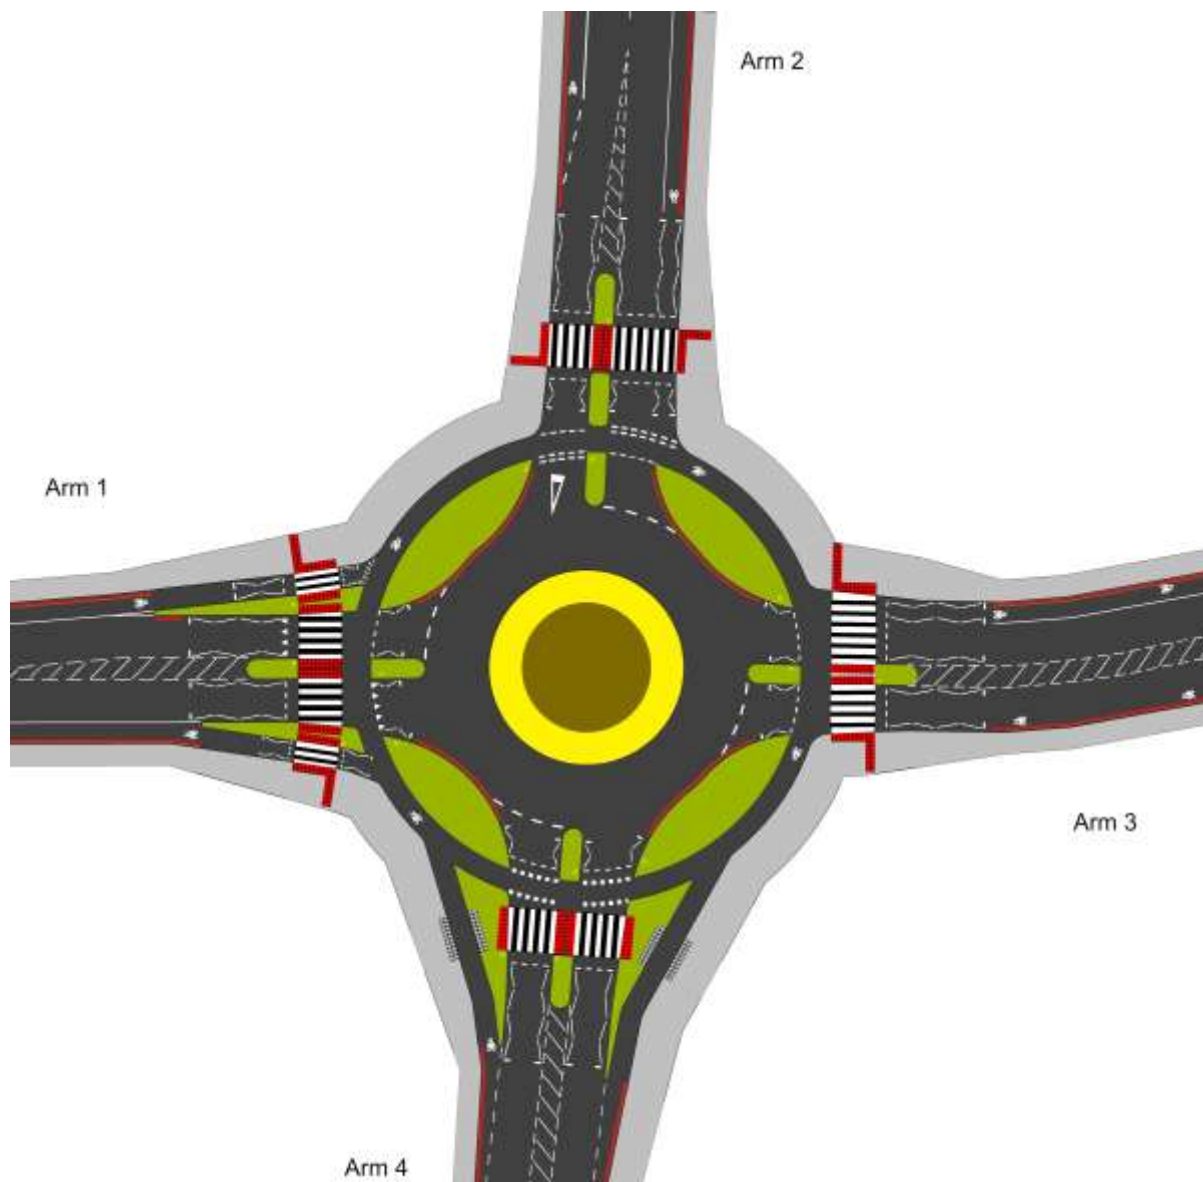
Layout of the Dutch-style Roundabout with UK road markings
